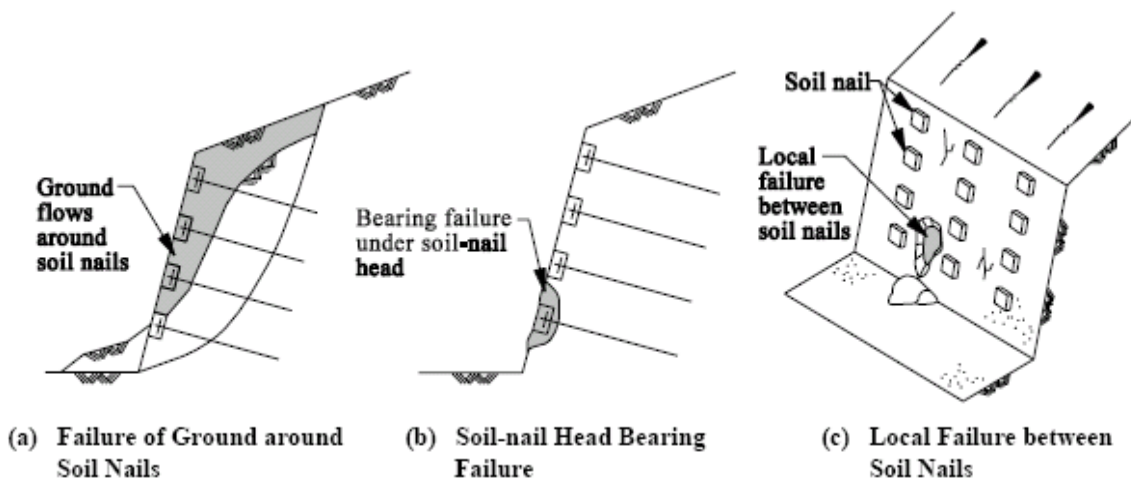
Potential external failure modes of a soil nailed system (after GEO 2008)
